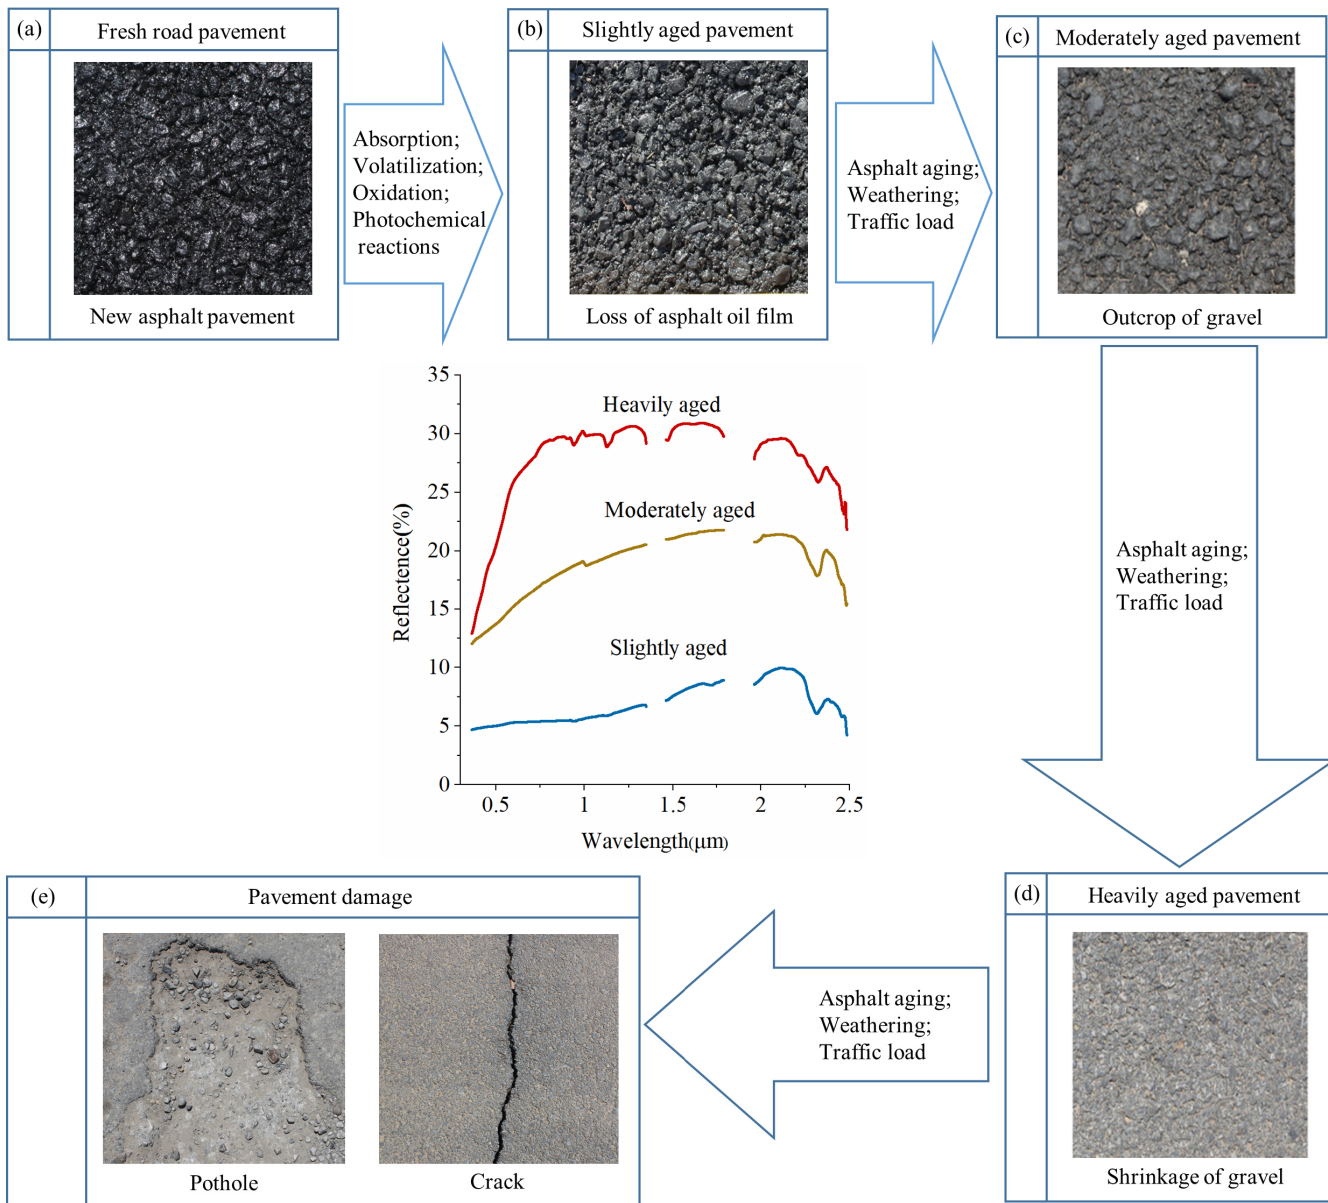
Illustration of the aging processes of asphalt pavement over time. (a) Fresh pavement, (b) Slightly aged, (c) Moderately aged, (d) Heavily aged, and (e) Pavement damages (e.g. crack, pothole, etc.). The pavement photos were captured by Canon 500, and the spectral curves were made from the in-situ measurements of pavement spectra using the portable ASD device.
